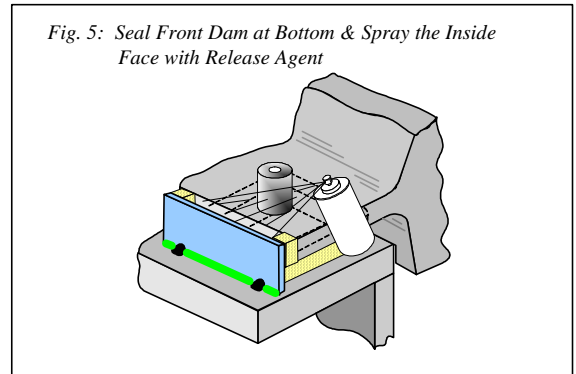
Seal Front Dam at Bottom & Spray the Inside Face with Release Agent
